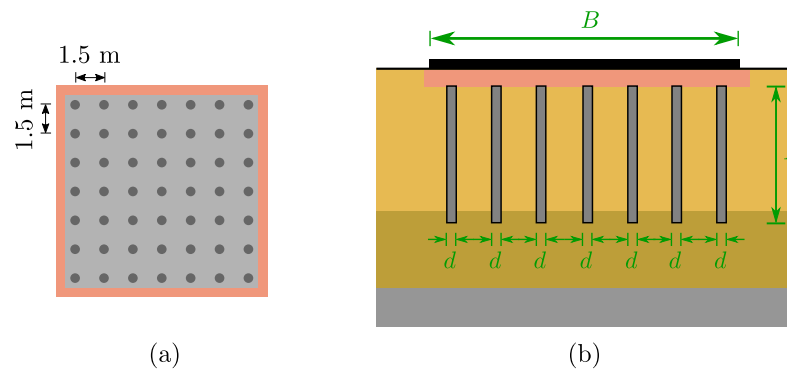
Large footing 7×7 configuration: (a) plan view and (b) section view
